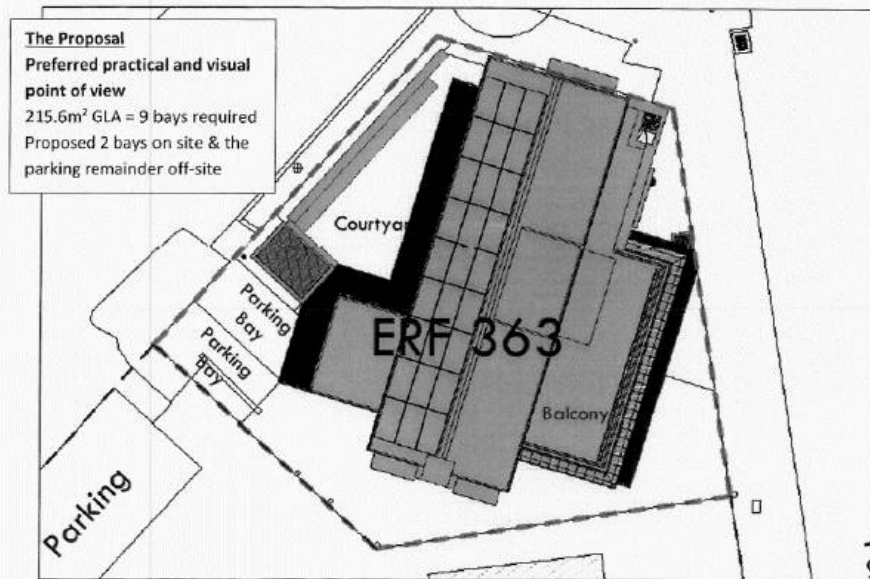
The new proposed Site Development Plan for Erf 363 Pringle Bay
